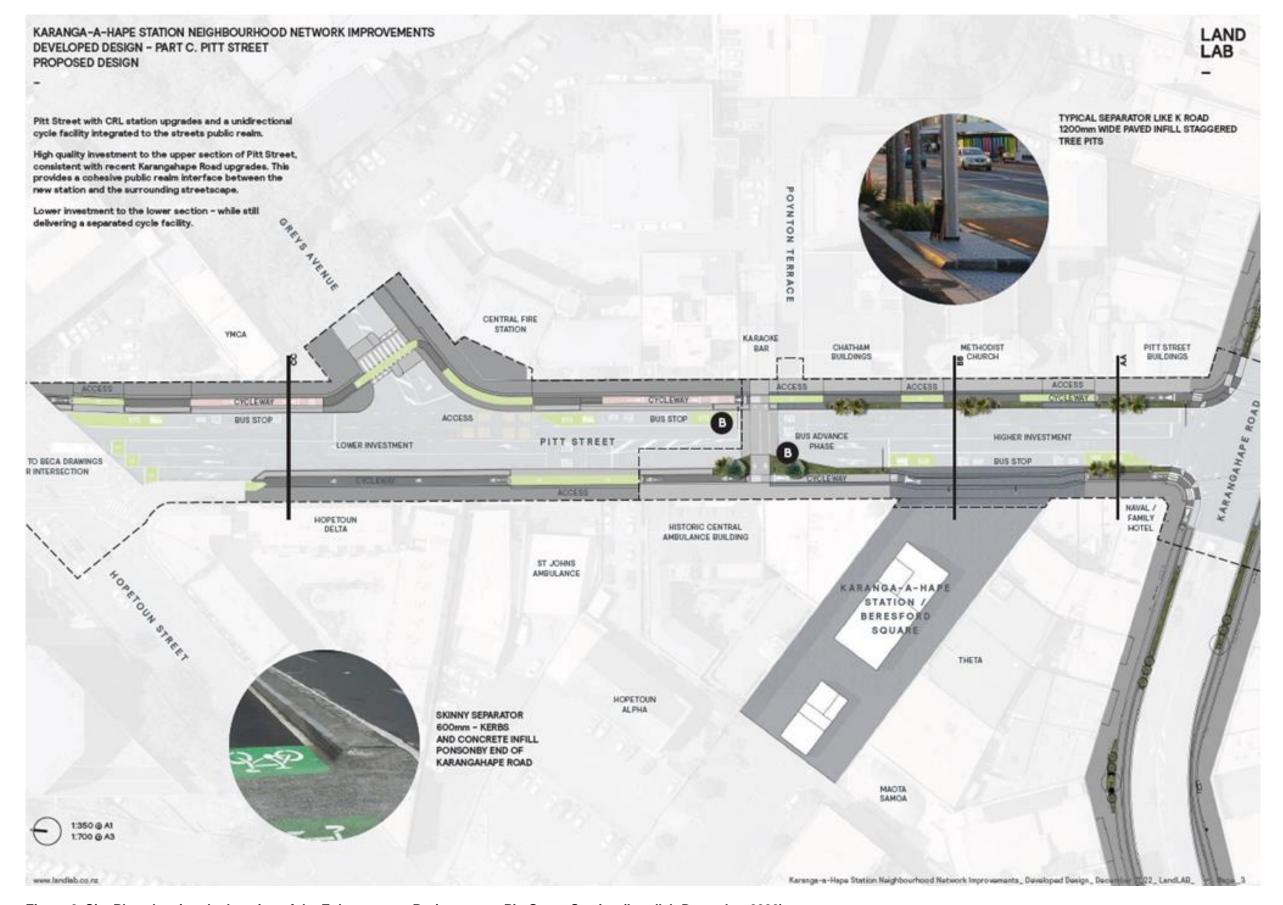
Site Plan showing the location of the Enhancement Project area – Pitt Street Section (Landlab December 2022)
